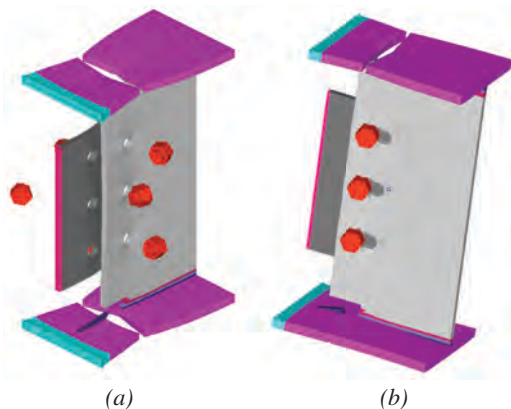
Failure modes of the WUF-B connection in tension: (a) shear fracture in bolts; (b) tear-out in beam web.
